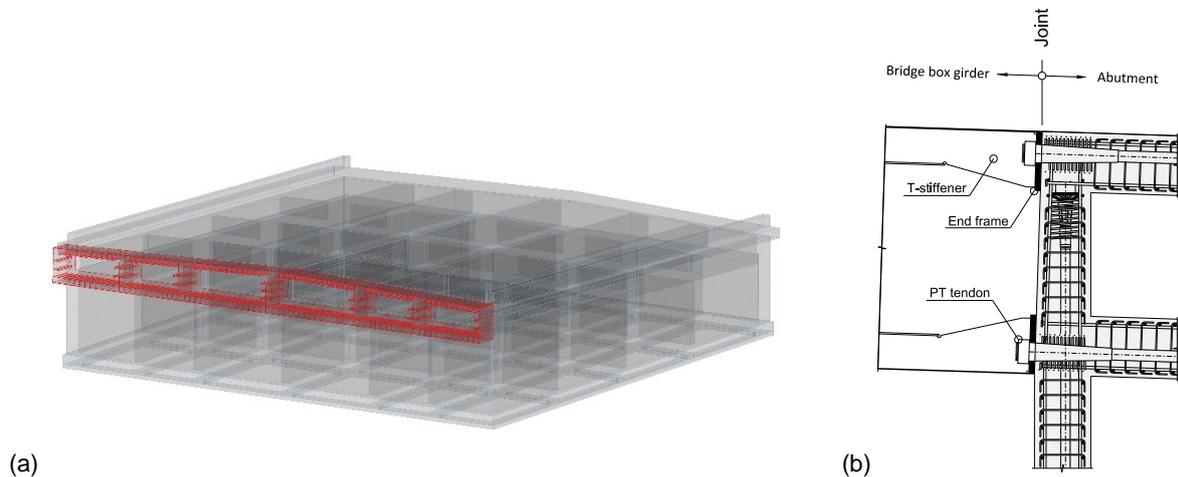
Isometric view of bridge end connection in North (a) and detail of post-tensioned joint (b).
